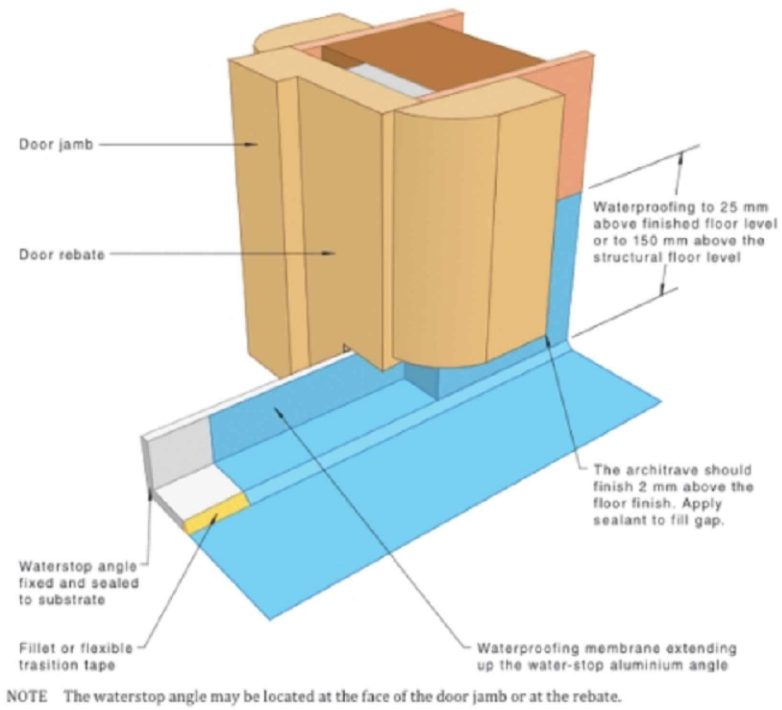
(A) — Example of liquid waterproofing at door opening framework
